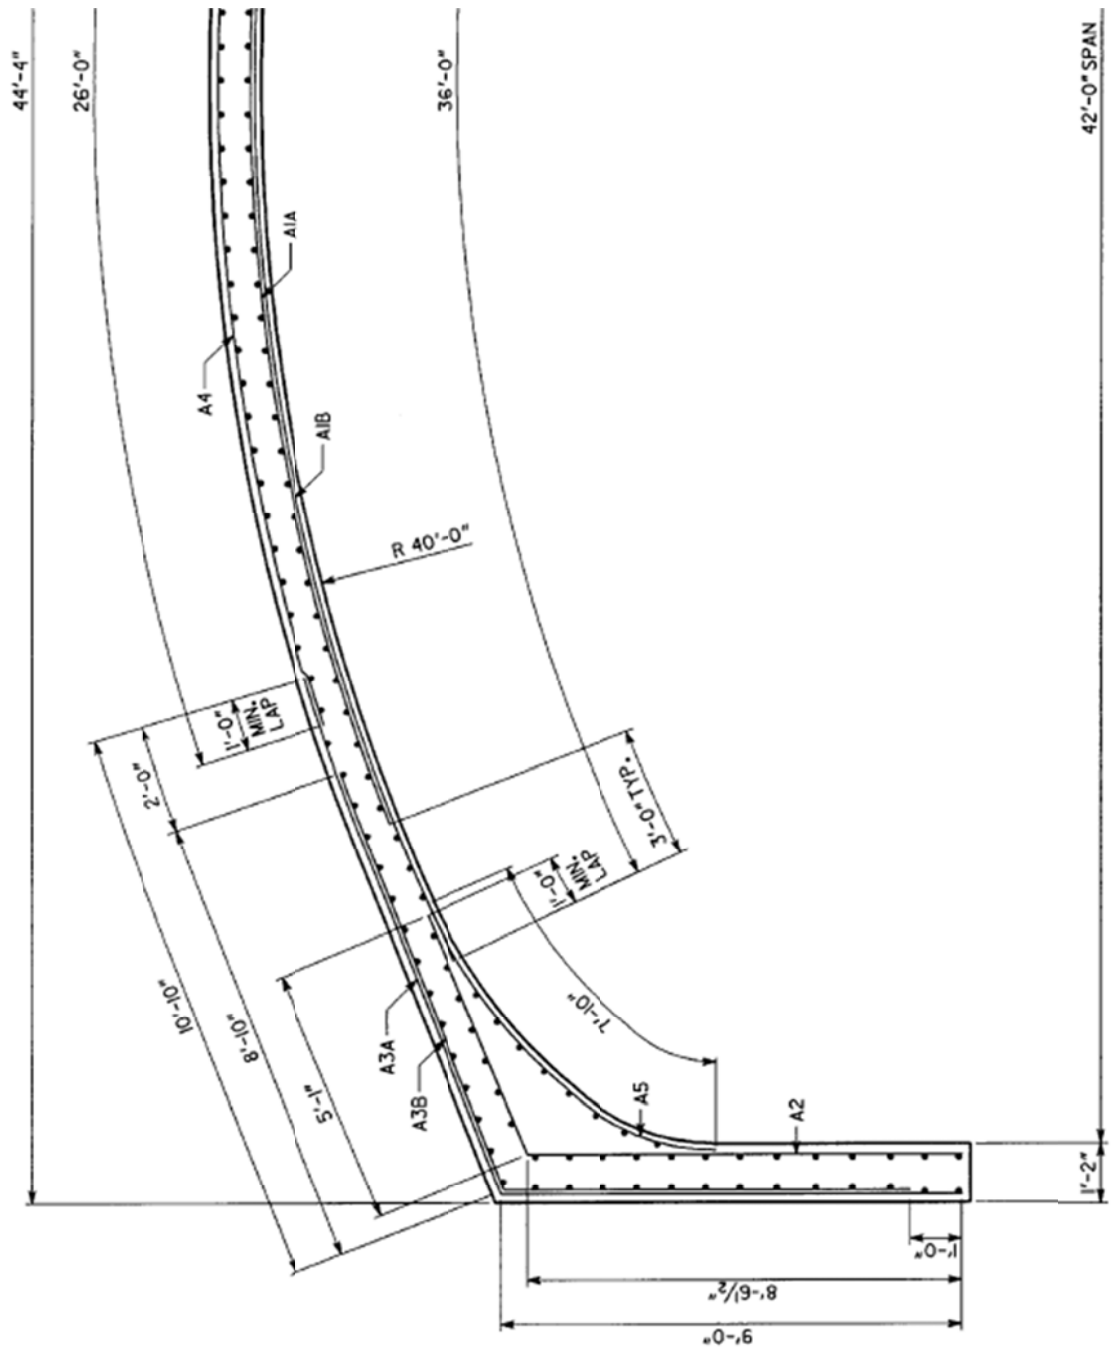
42 ft Bridge Unit Reinforcement Layout (FoleyArch 2010)
